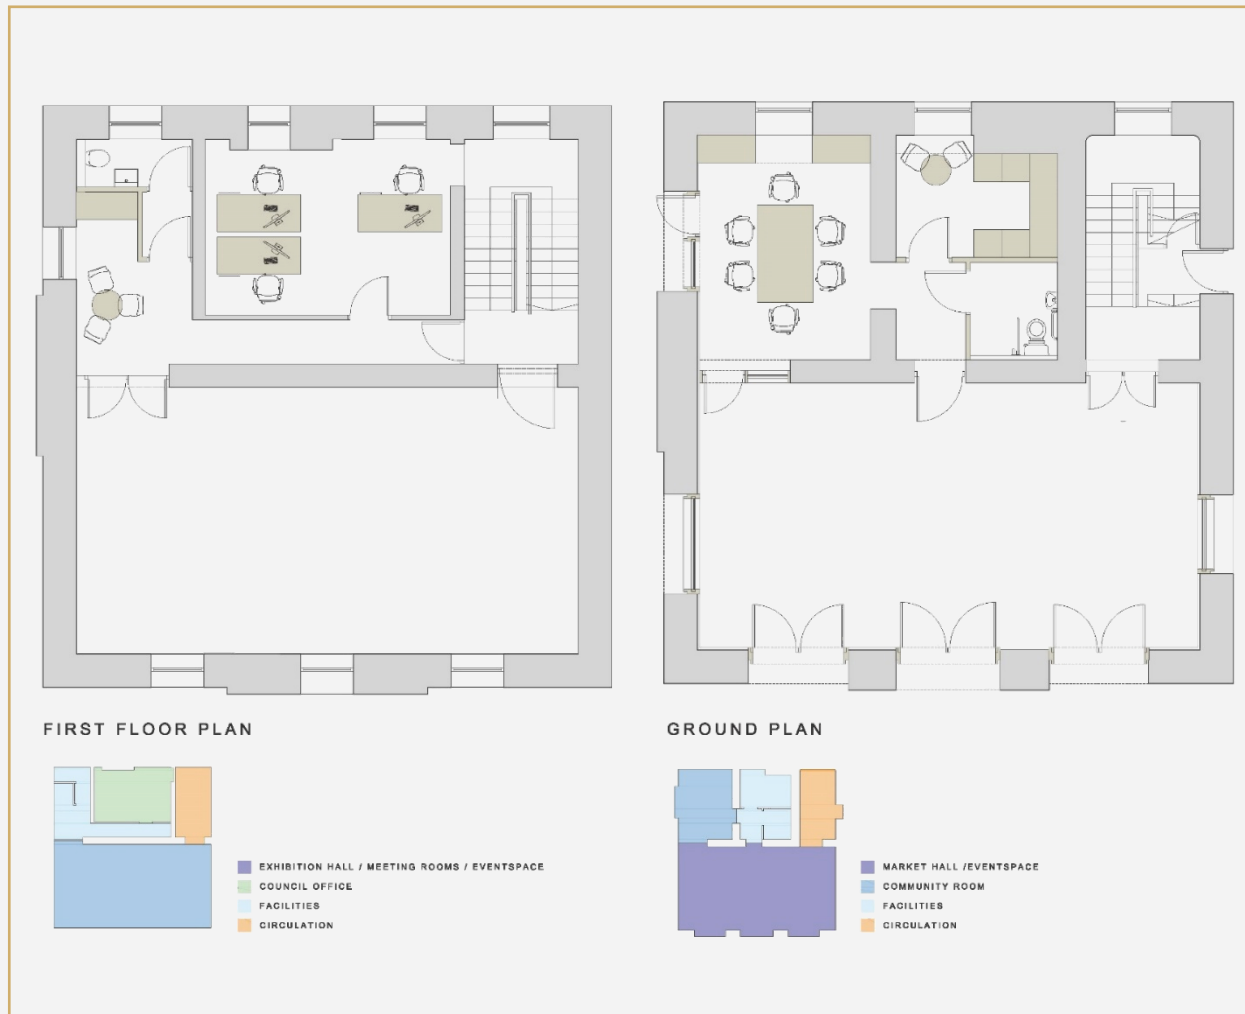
Proposed Architectural Plan (drawings by Wilson Architecture)
